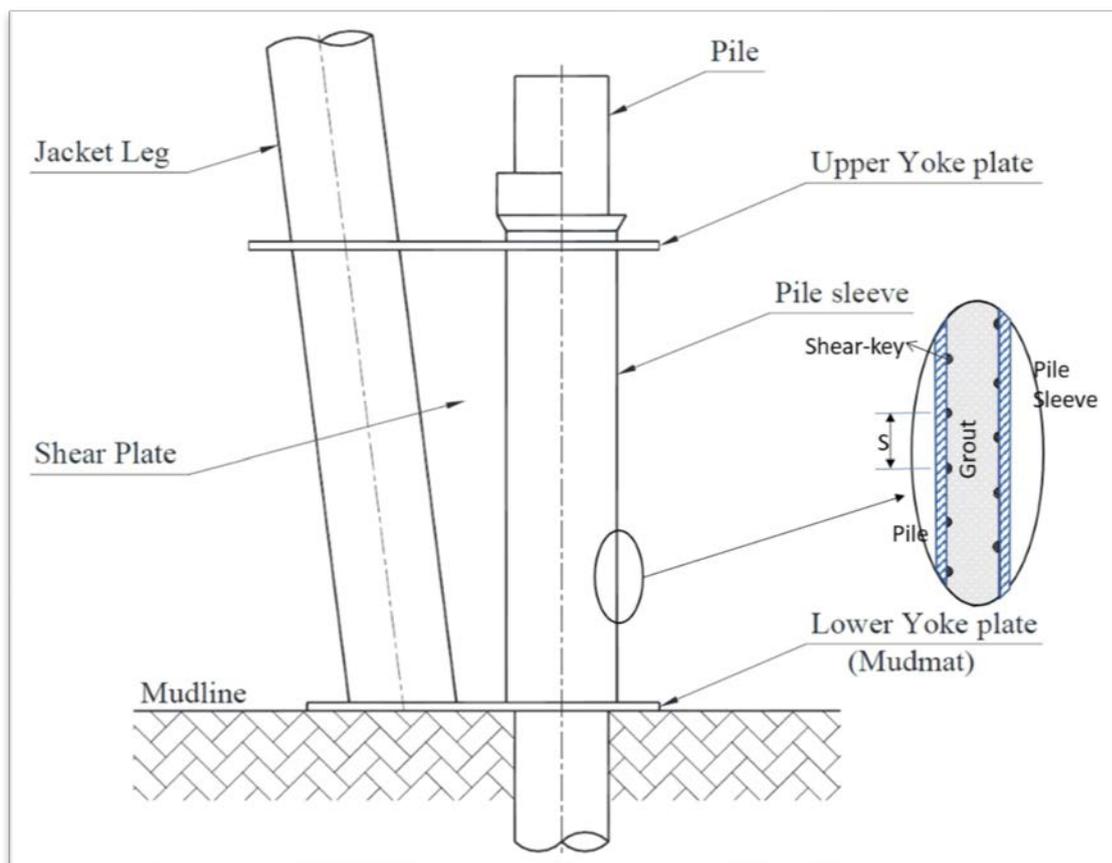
Pile / sleeve connection showing the jacket leg, the upper and lower yoke plates, the pile, and the insert showing the weld beads and the pile and the pile sleeve forming the shear keys. Illustration from N-004.
